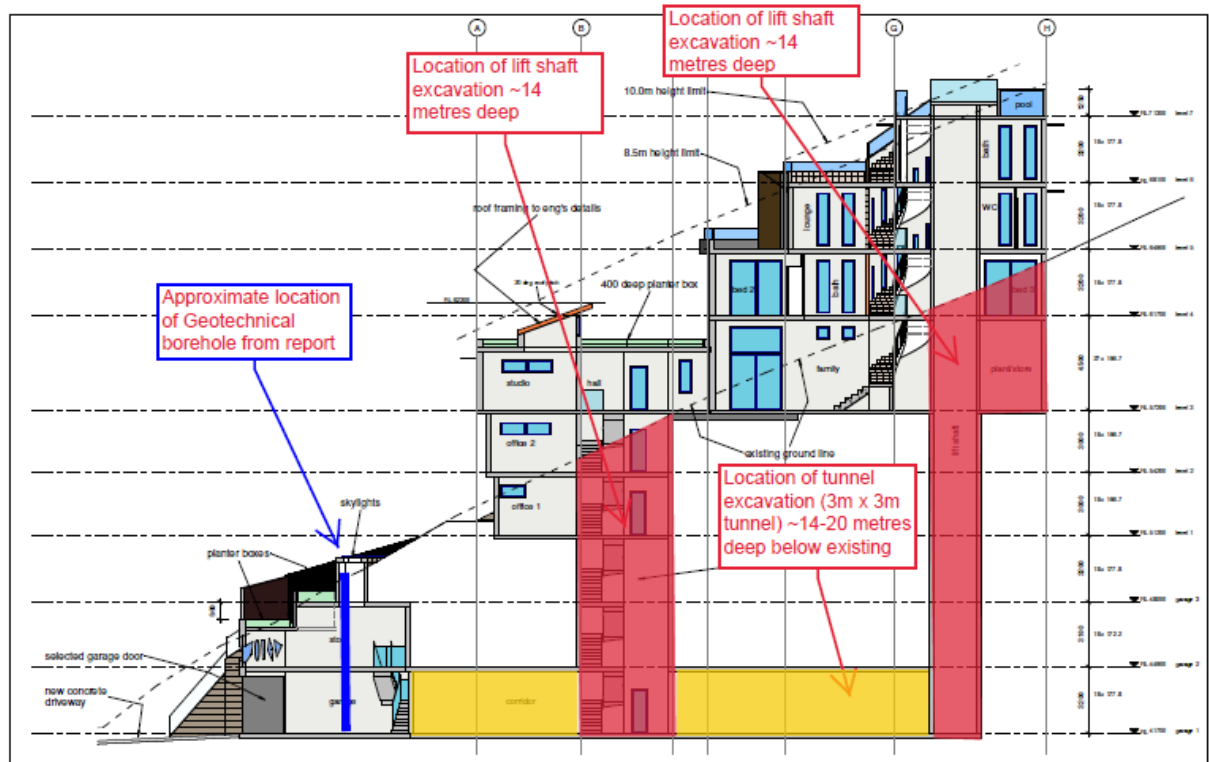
Cross section showing borehole and major horizontal and vertical excavations
